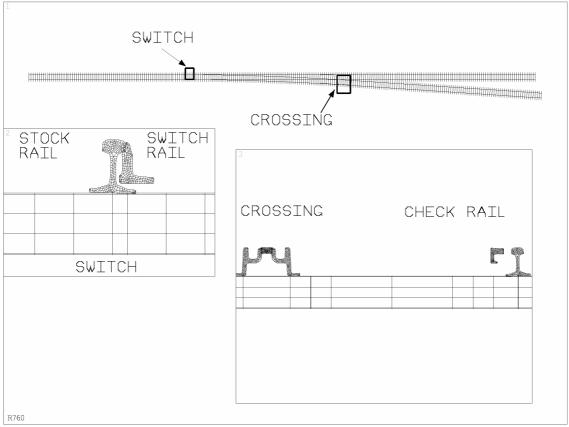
Model of the UIC60-760-1:15 turnout – Zoom on sections of the switch and the crossing
